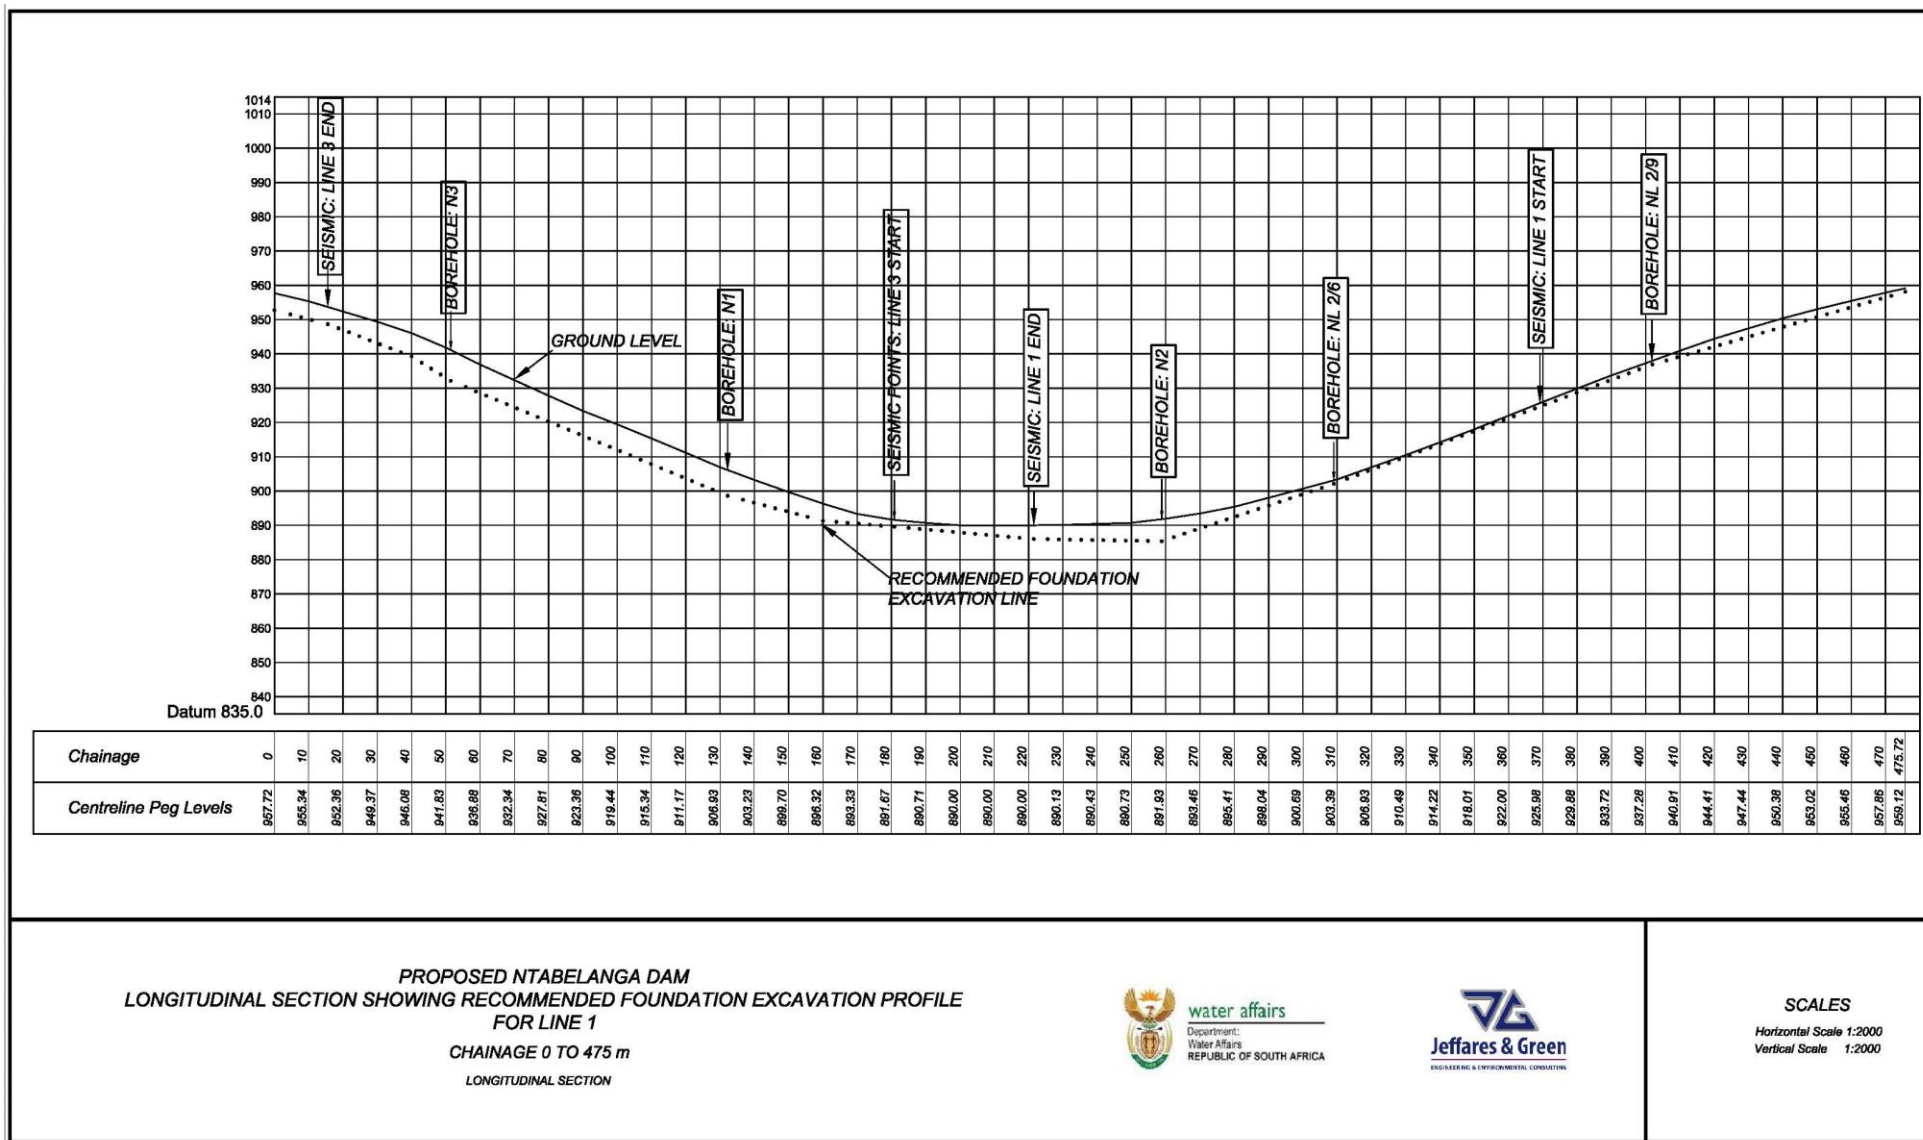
LS - Recommended Foundation Excavation Profile for Line 1
